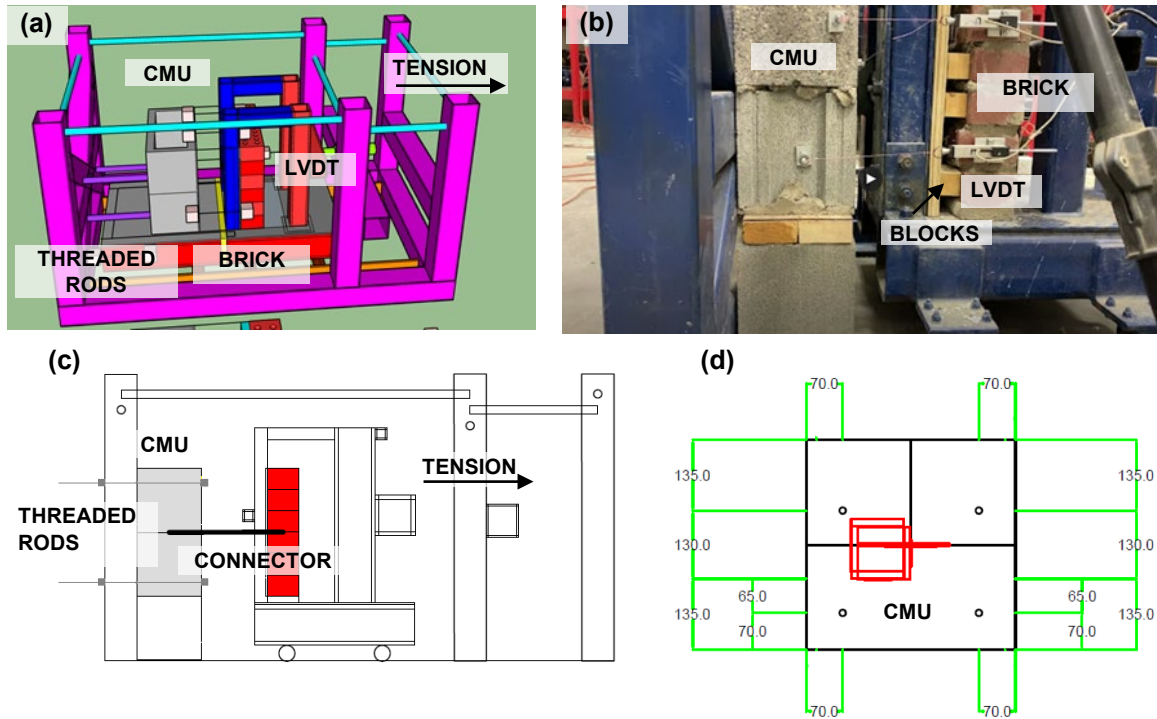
Tension testing with specimen in experimental frame of (a) initial conceptual design, (b) actual testing set up including blocks for even loading distribution, (c) actual test set up illustration, (d) threaded rod locations. All dimensions in mm.
